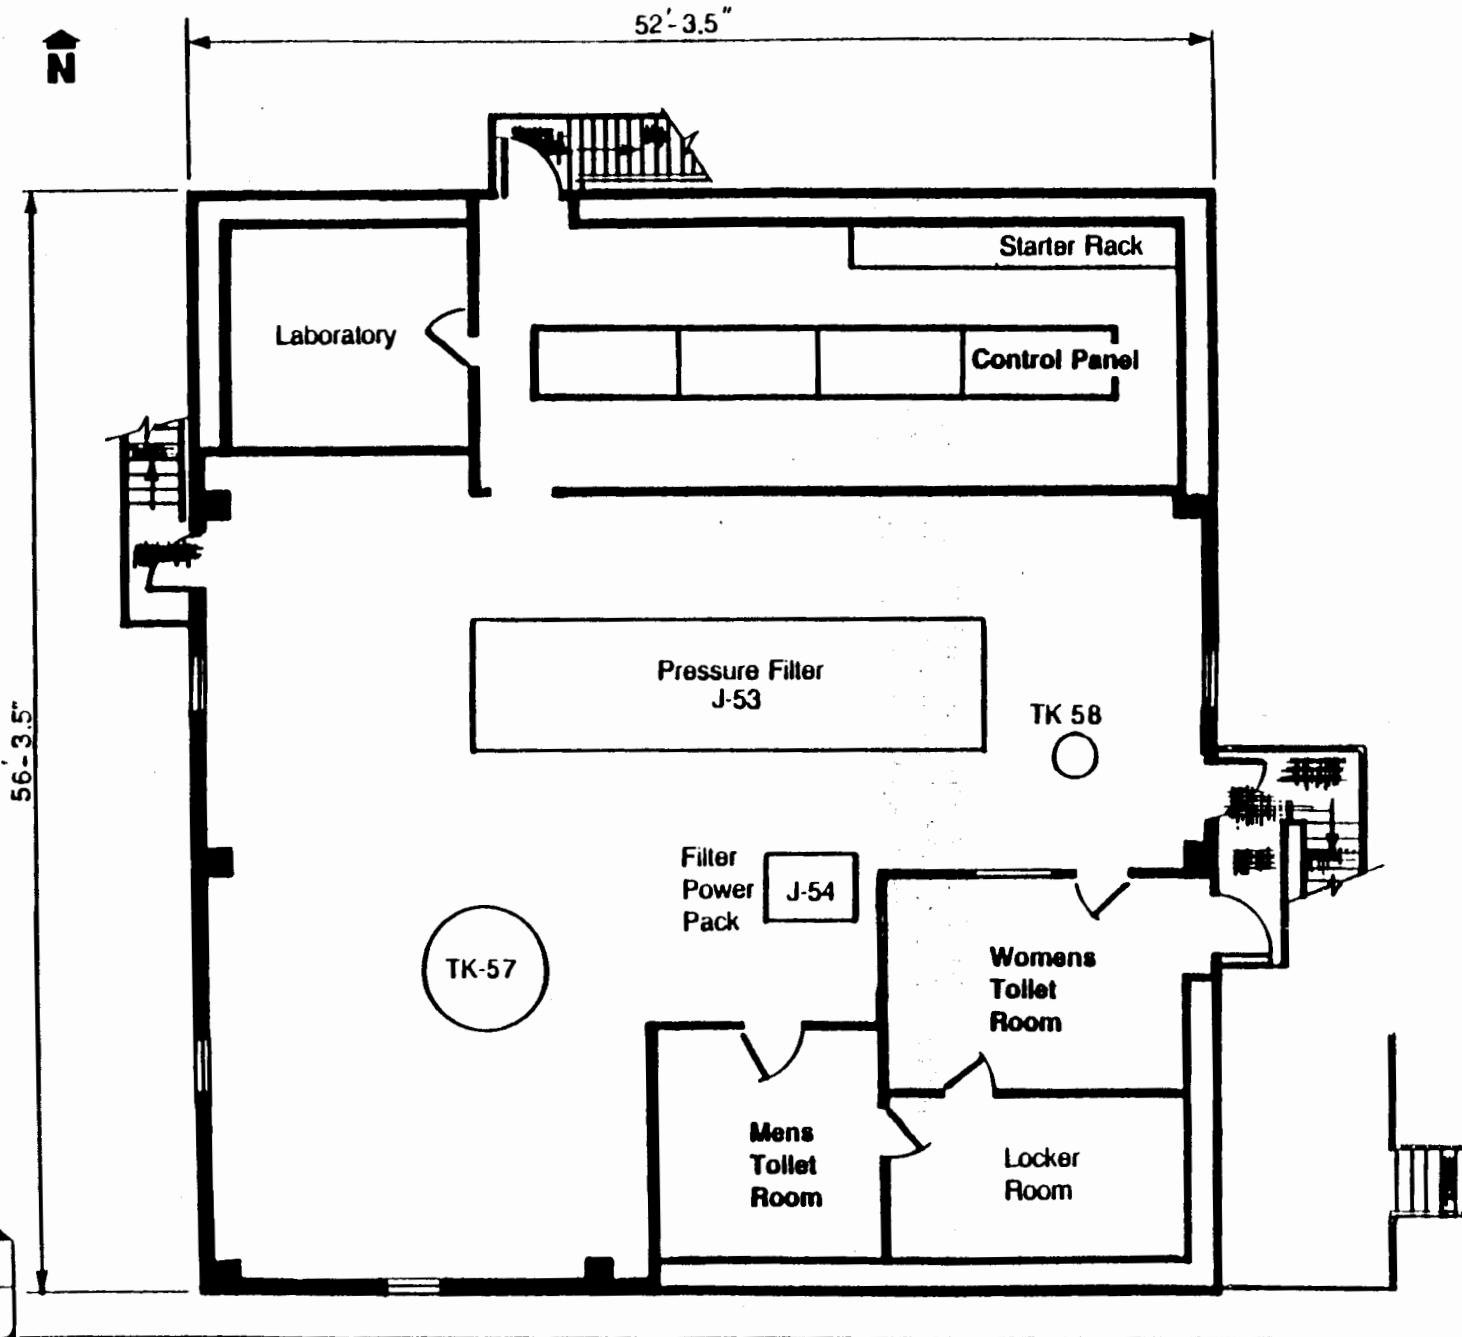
Solid Waste Facility Filter Press Building Second Floor Layout Diagram
